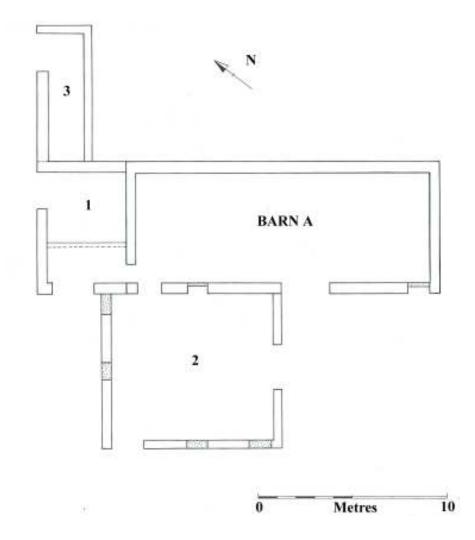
Ground Floor Plan of Barn A and adjoining buildings
